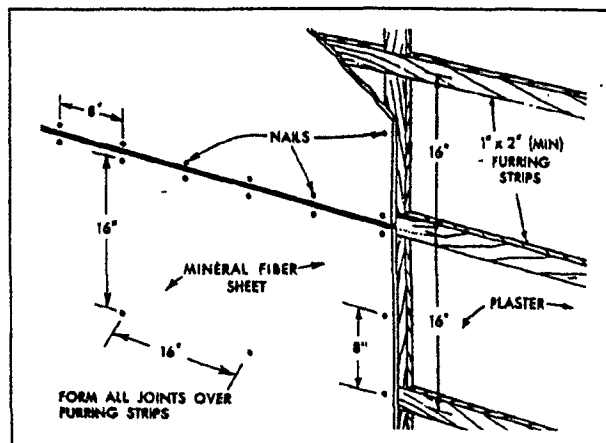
INTERIOR WALLS, OVER PLASTER - Install 1 in. x 3 in. furring strips on 16 in. centers and apply Flat Sheets. Form all joints over furring strips.
